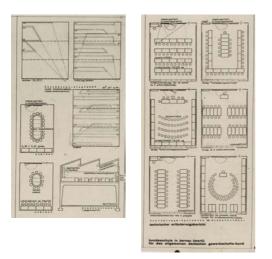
Design studies on group size and exposure to sunlight for classes and seminars in the ADGB Trade Union School, plan 1927, Bauhaus-Archiv Berlin
